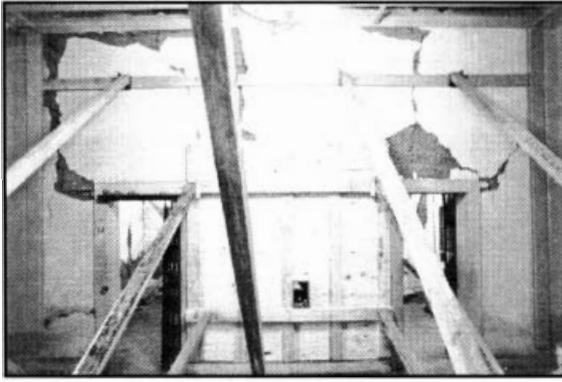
North side of the transverse wall between Rooms 9 and 10. Figure 9.5 shows the opposite side of the wall.
